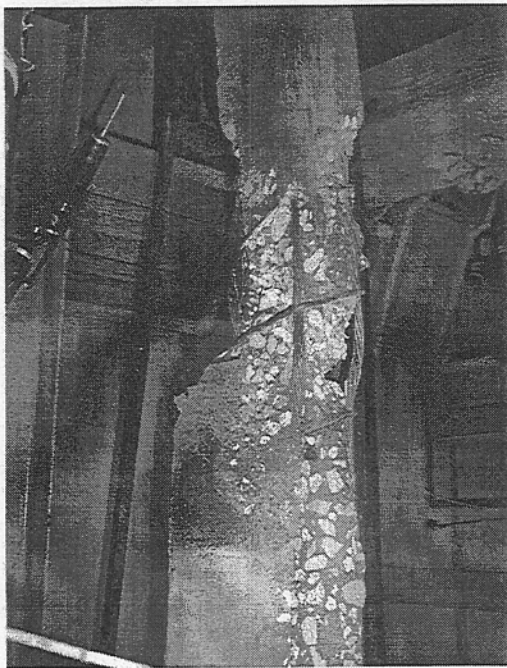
Failure Mode of PROTECRETE Specimen Under Axial Loads.
